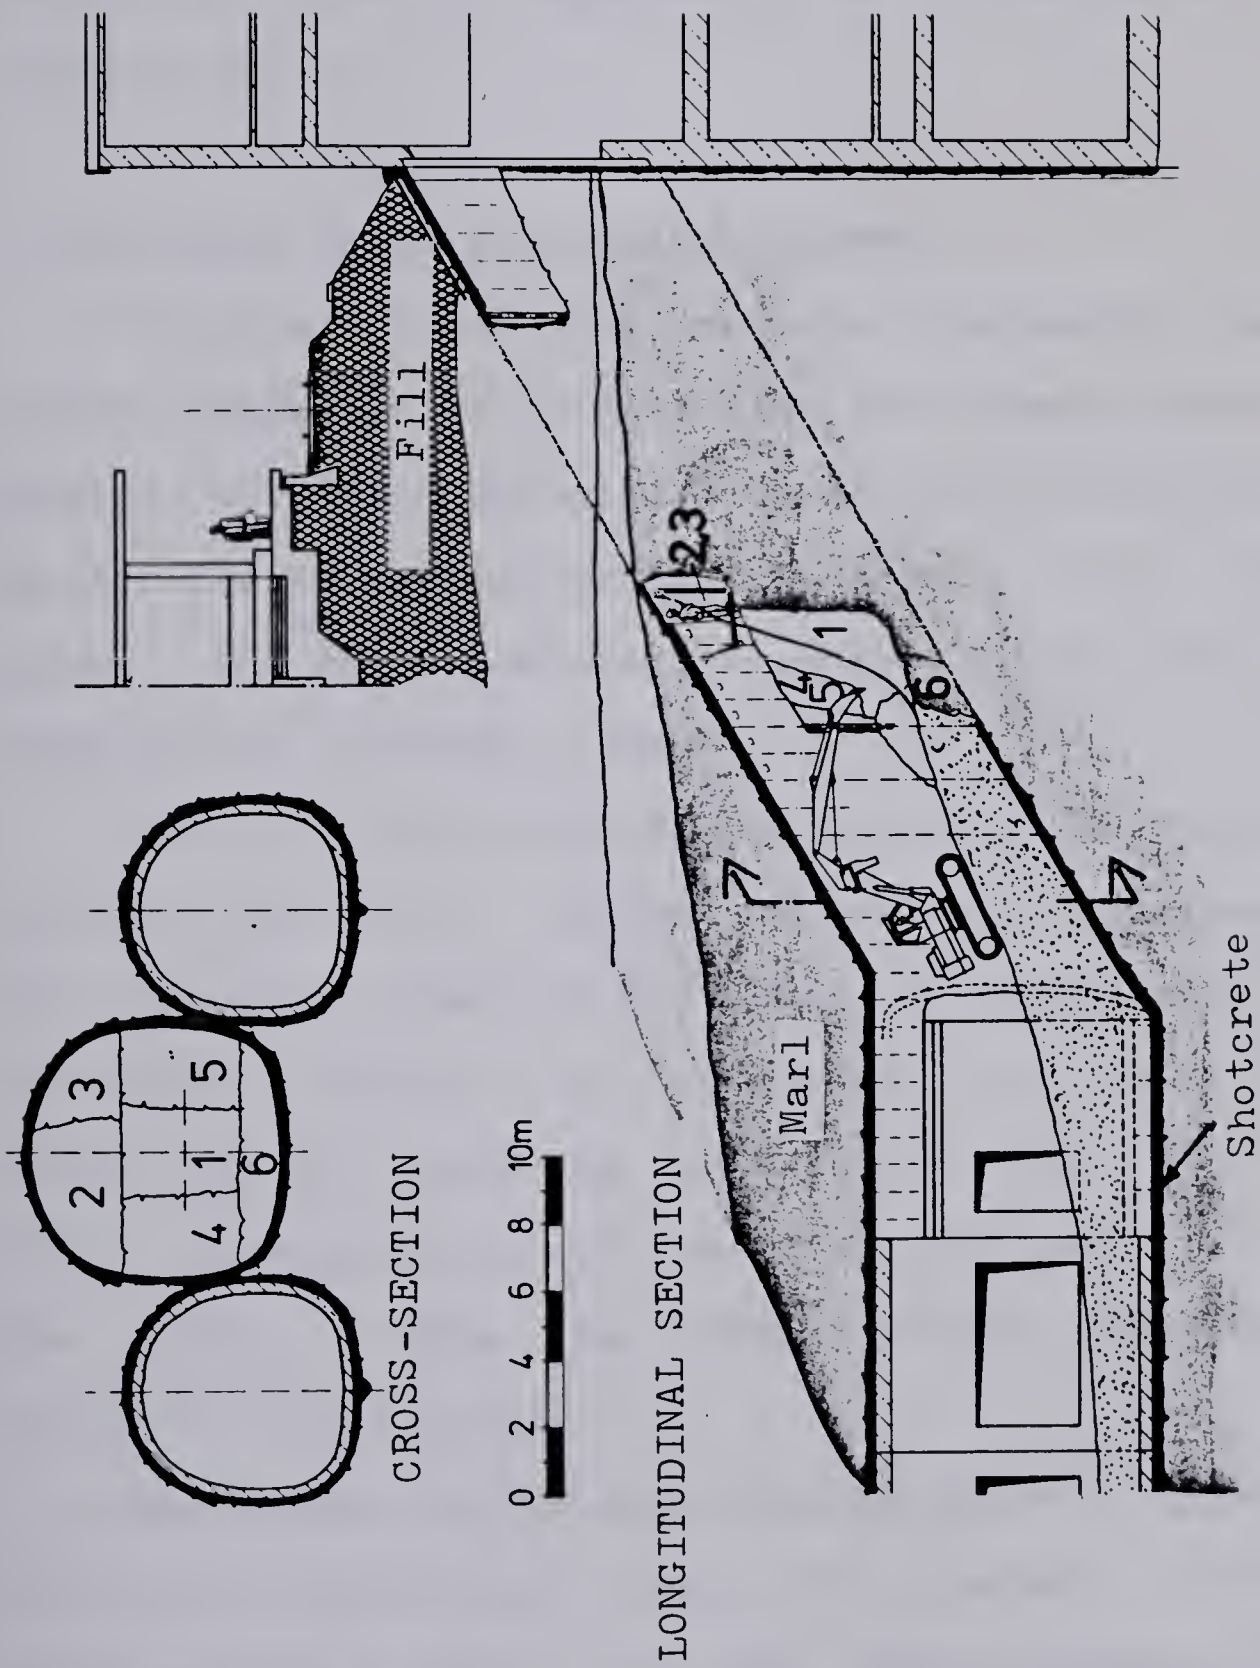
Excavation of stair passageway under Bochum main railway station (after Schulze, 1982:modified)
